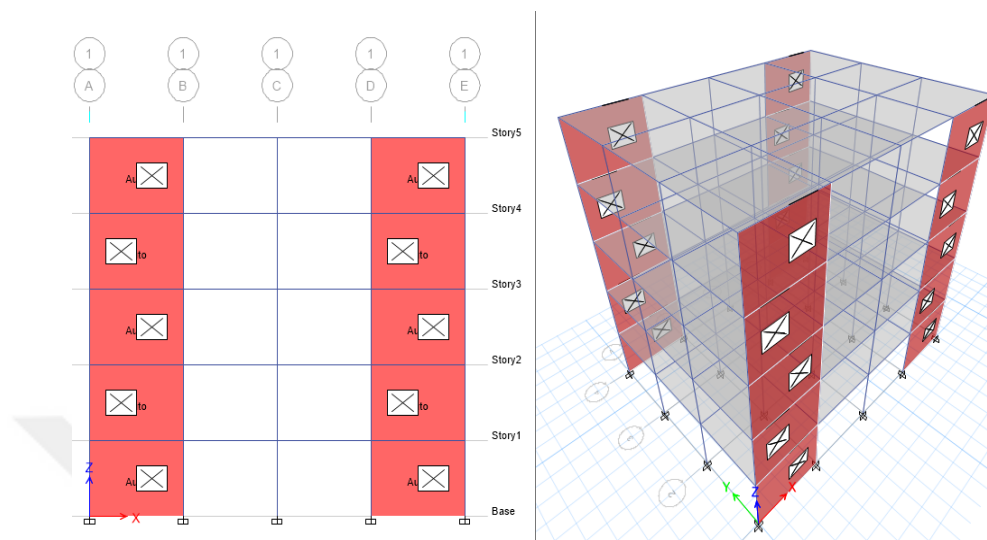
The 5-story building with concrete shear walls and with zigzag openings.
